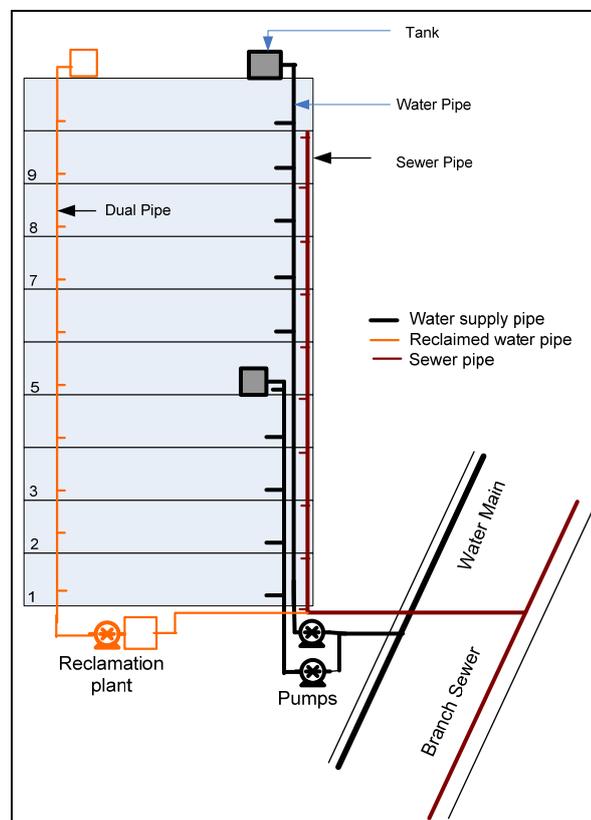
On-site wastewater system (Source: Sharma et al, 2005)
